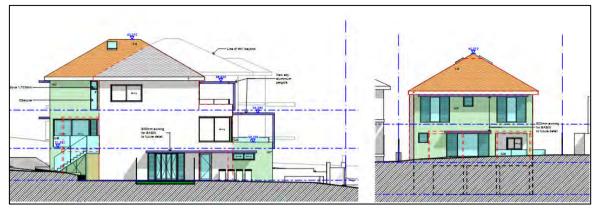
Northern side elevation (L) and the eastern rear elevation (R).
